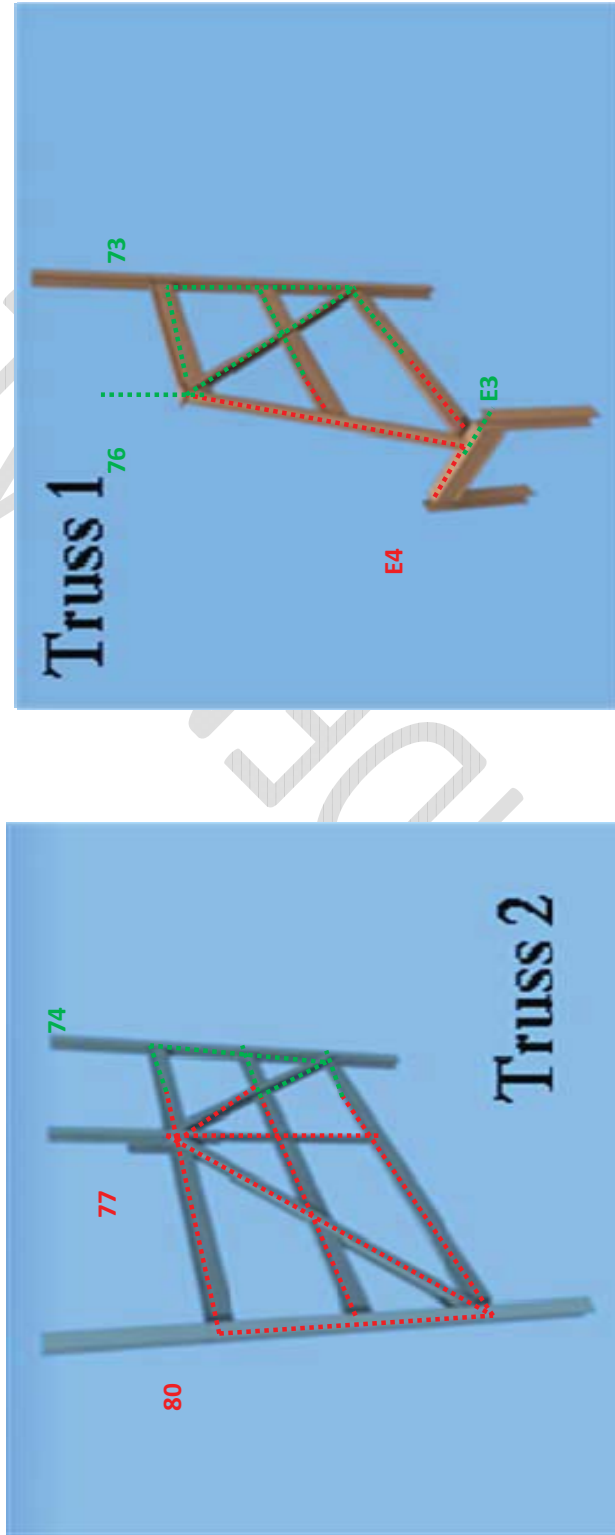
Schematic of Truss 2 (a) and Truss (1) showing in red the areas immersed within the Mechanical Room and in Green the areas outside the Mechanical room.
